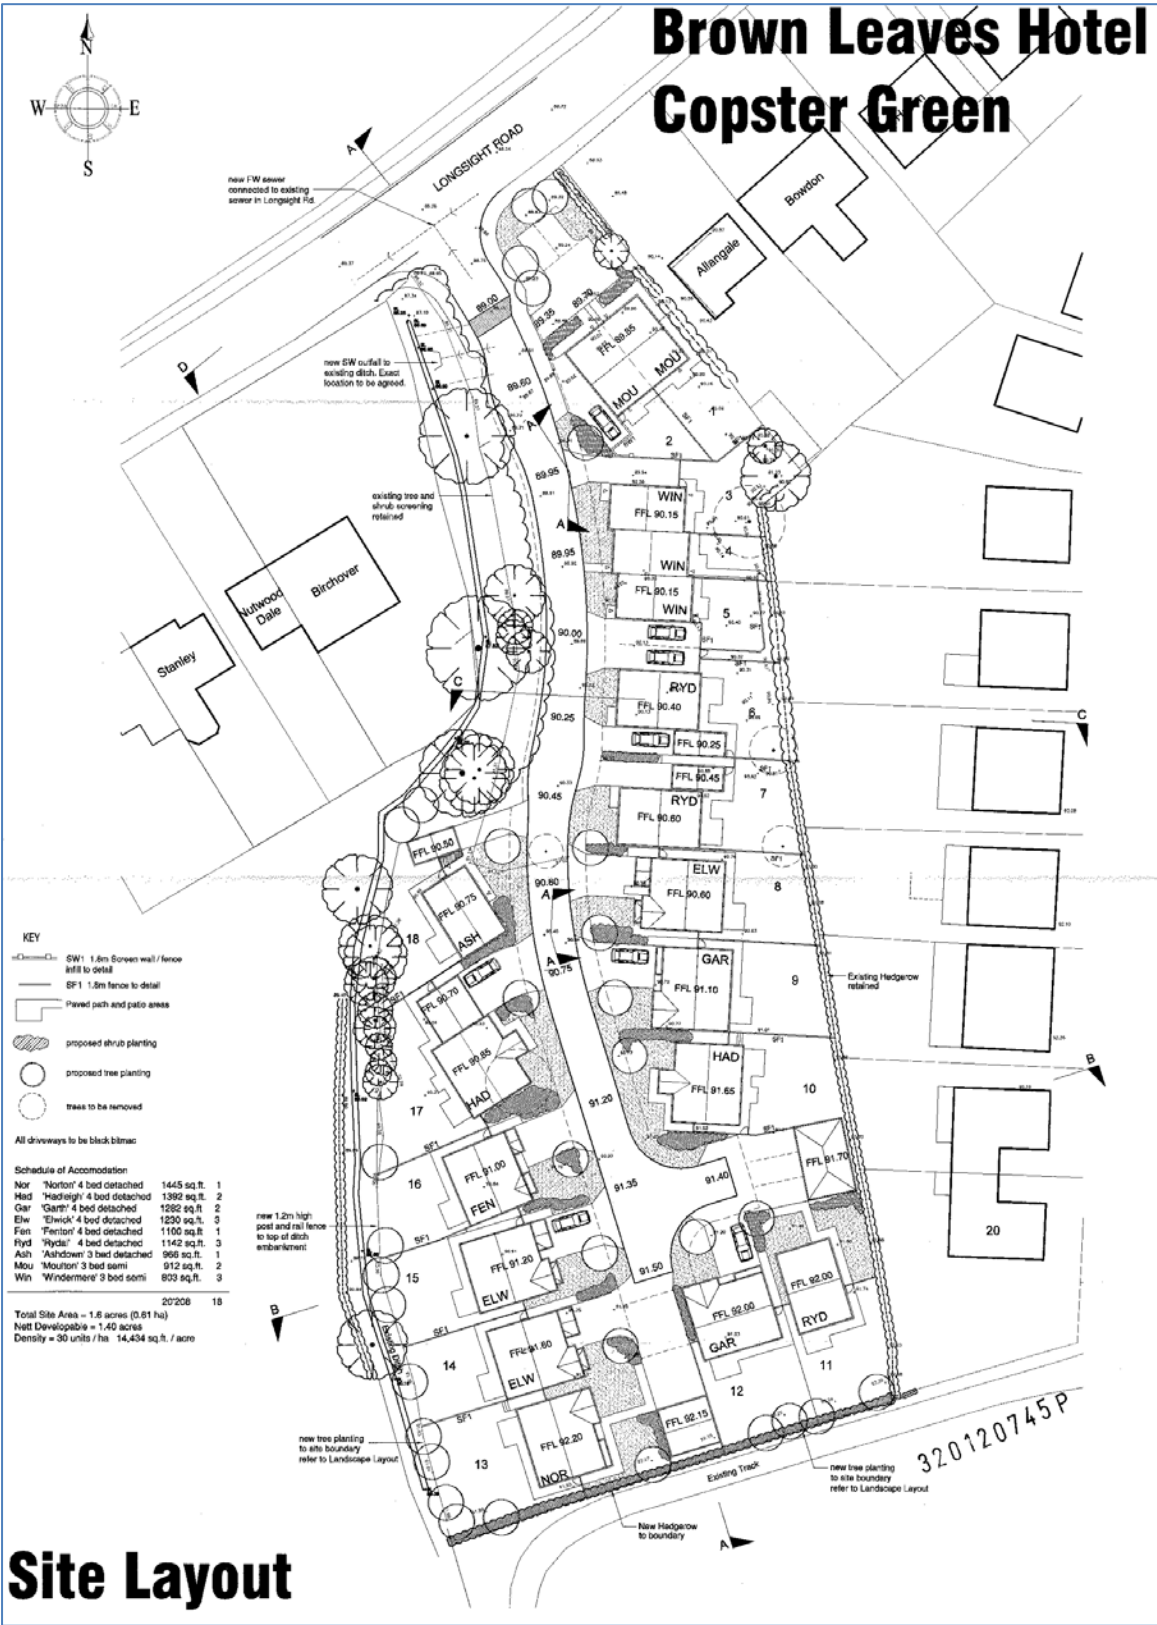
Site Layout Plan 'B' Brown Leaves Site
